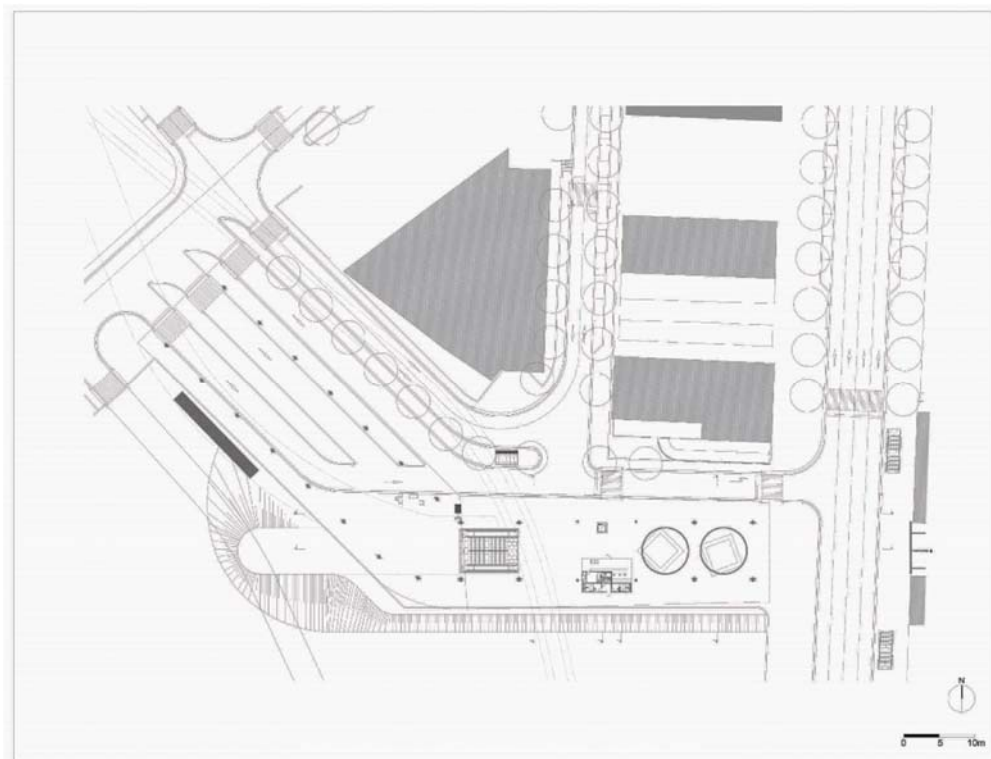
Casa de Musica station surface level site plan (Eduardo Souto de Moura).
